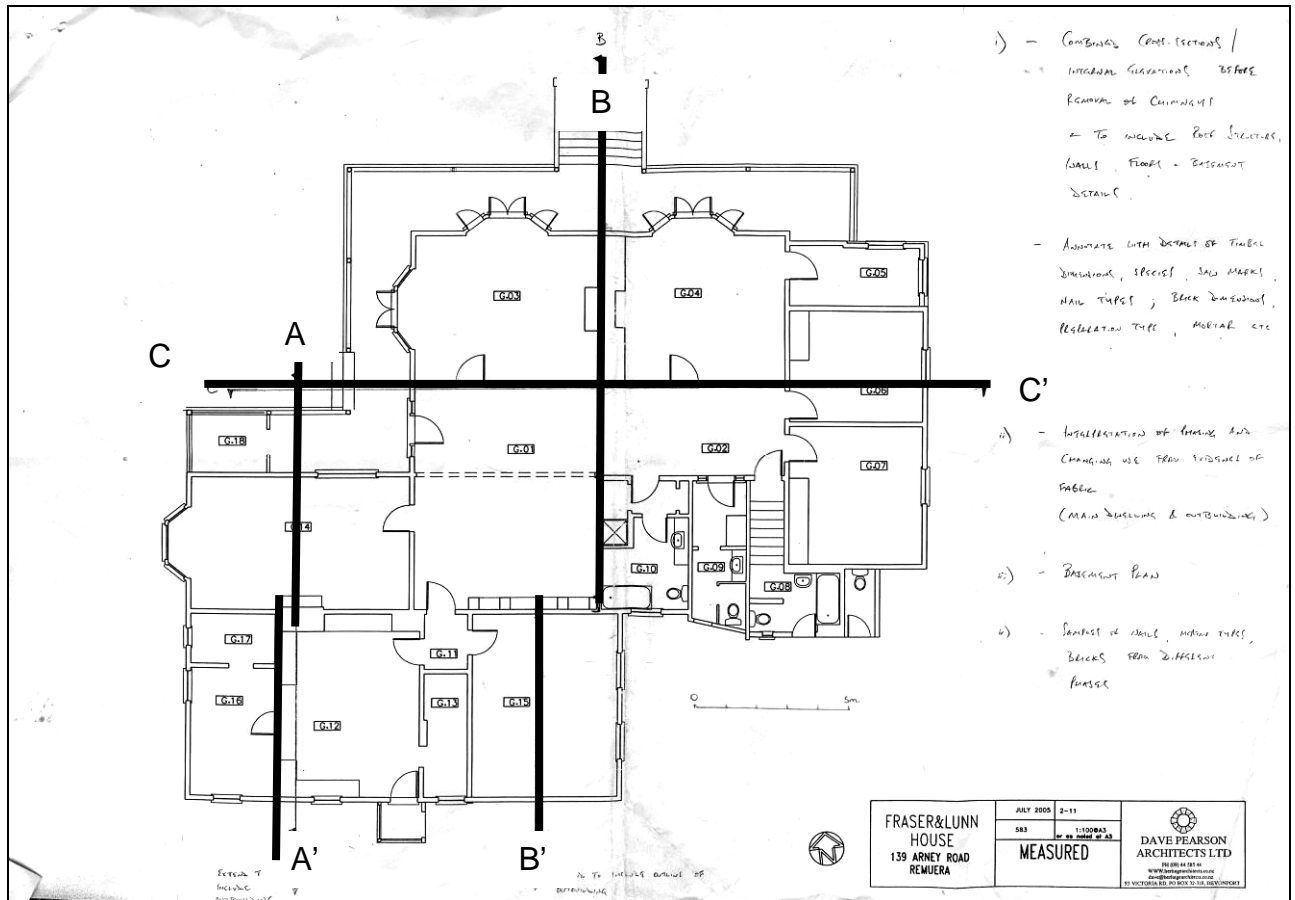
Floor plan of house (Pearson 2005: 18) showing the profiles drawn in detail for the current study
